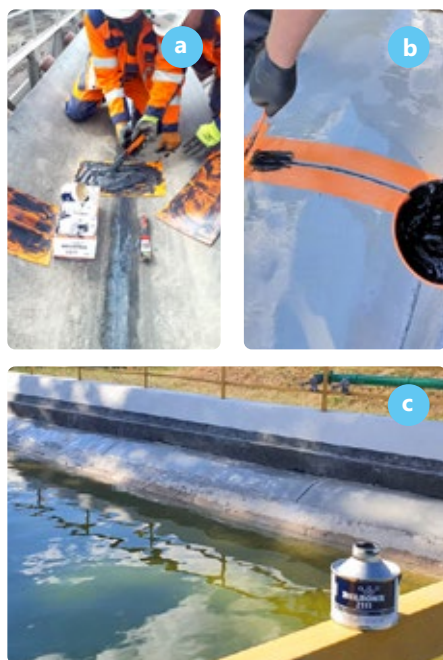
a) Repairs of damage to rubber and plastic elements, b) and c) sealing of expansion joints of fire prevention water tank
